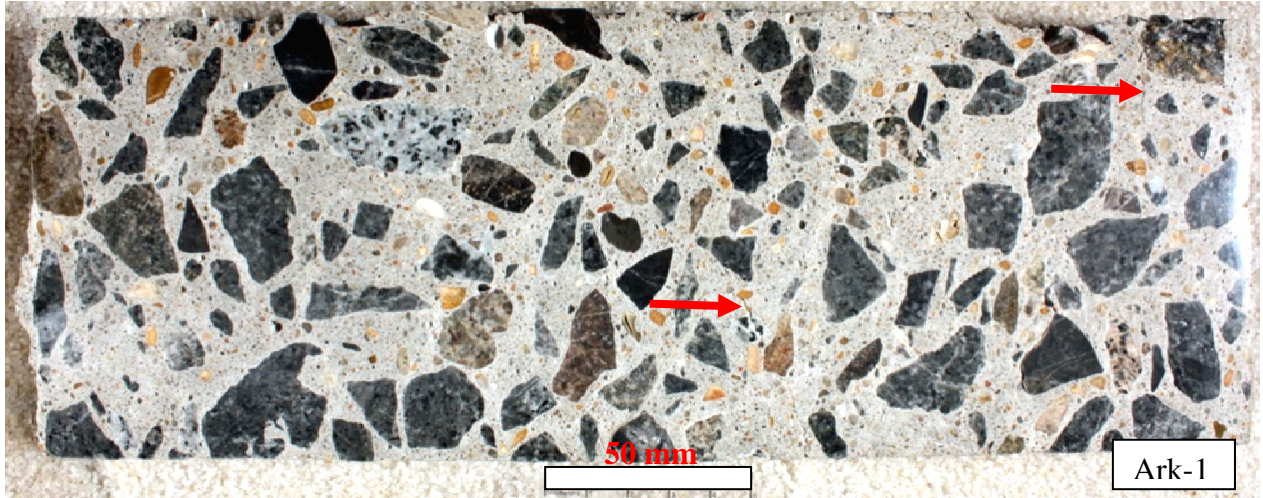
Polished concrete sections from Arkansas DOT (the pavement surface is on the right side). Significant cracks are identified with red arrows.
